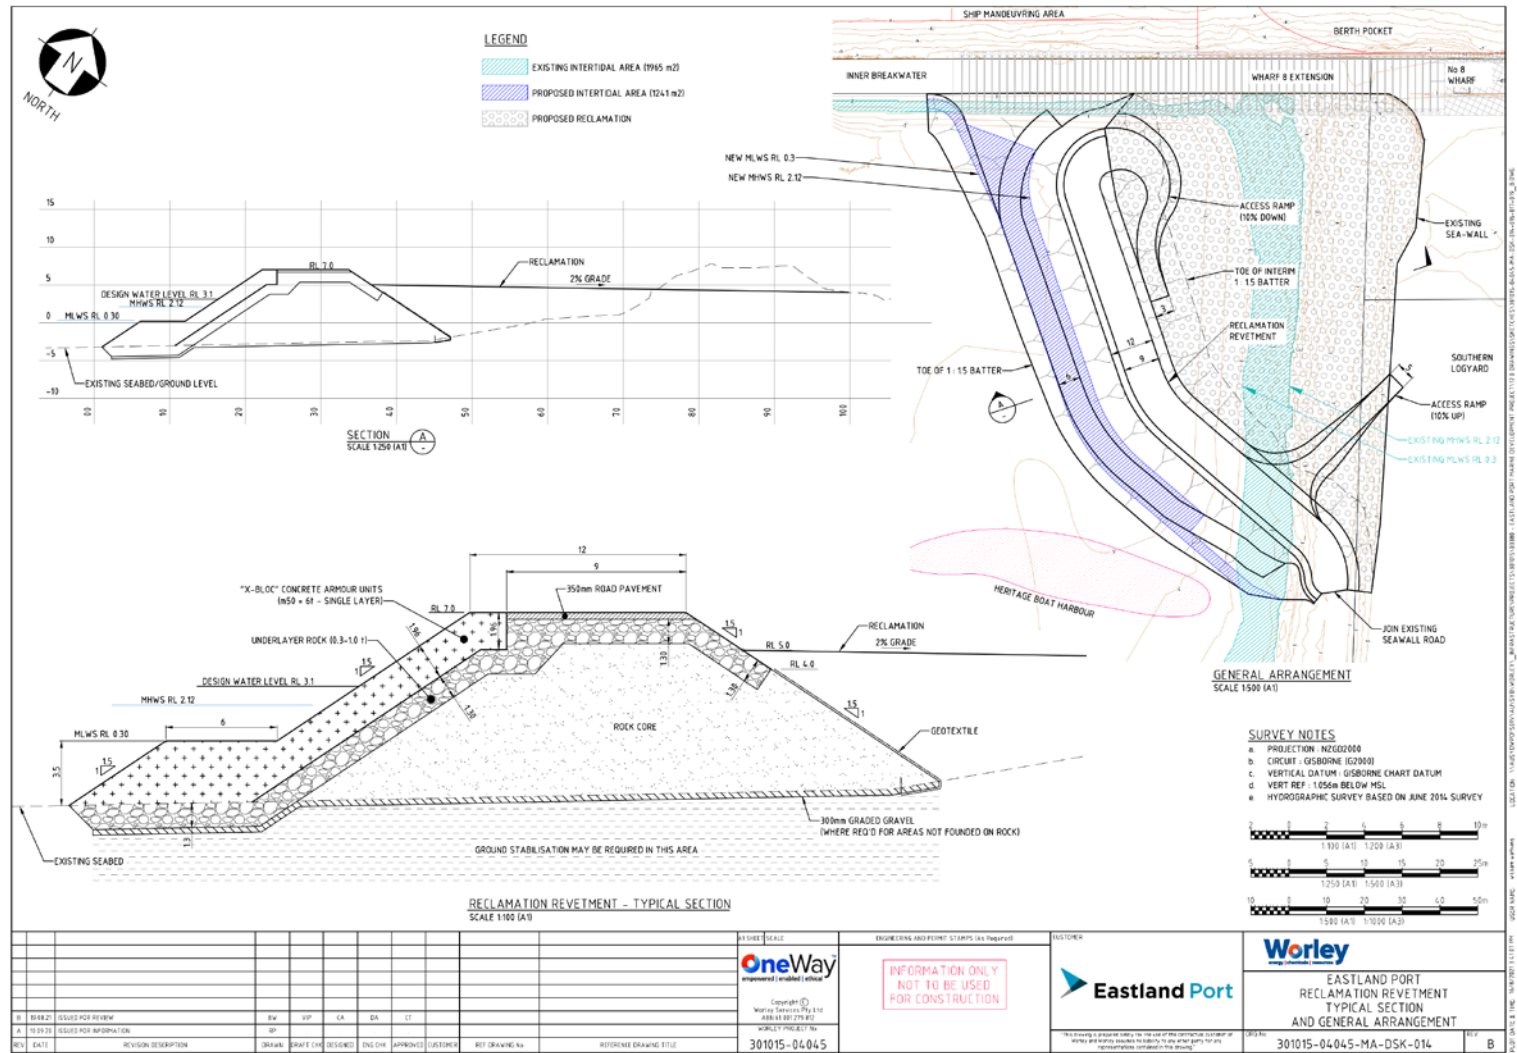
Eastland Port Reclamation, Revetment and Typical Section
